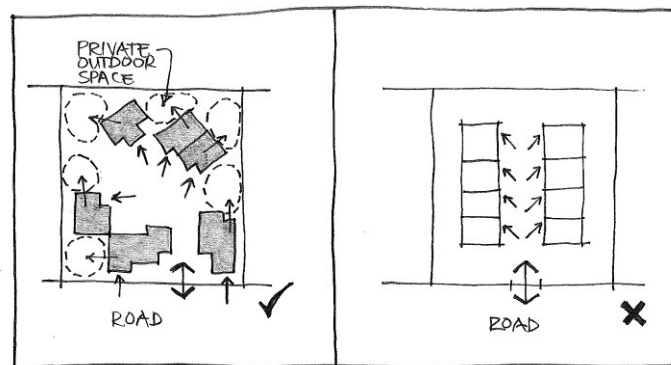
Carefully considered layout of buildings on sites helps to contribute to a more pleasant living environment.
